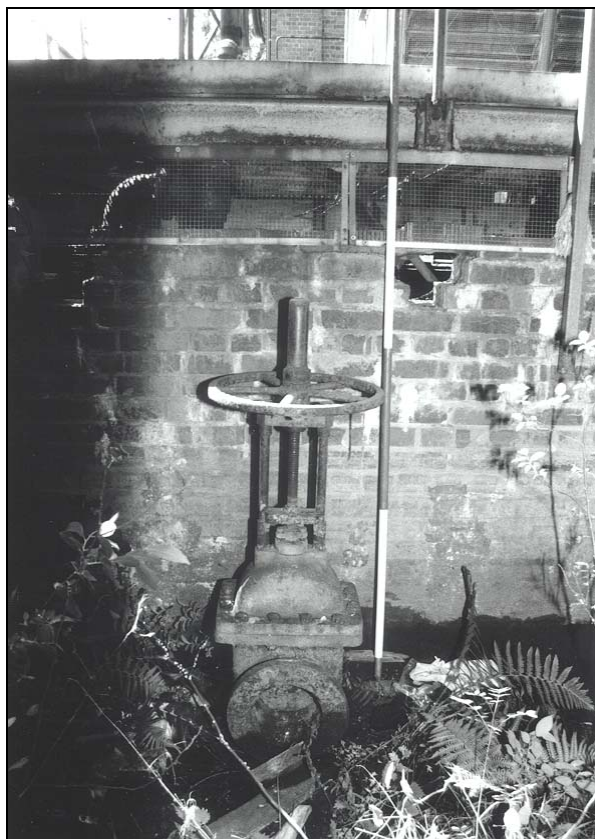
Detail of tapped valve in southern elevation of north trade effluent plant/ cooling pond.
